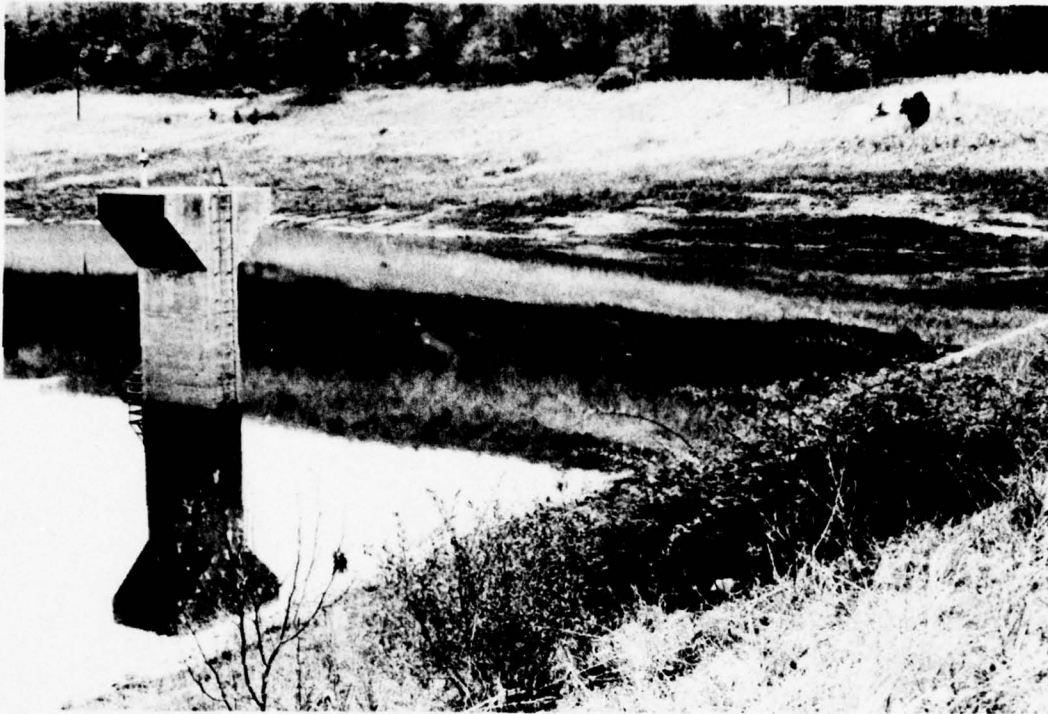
Upstream View of Emergency Spillway and Rock Disposal Area
